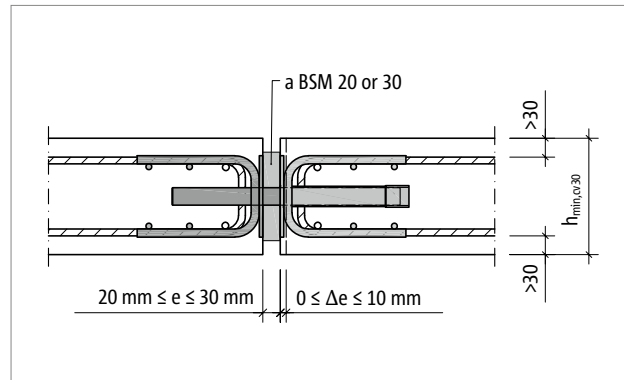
Positioning of the fire protection collar with a joint width of 20 or 30 mm and a maximum joint opening of 10 mm
